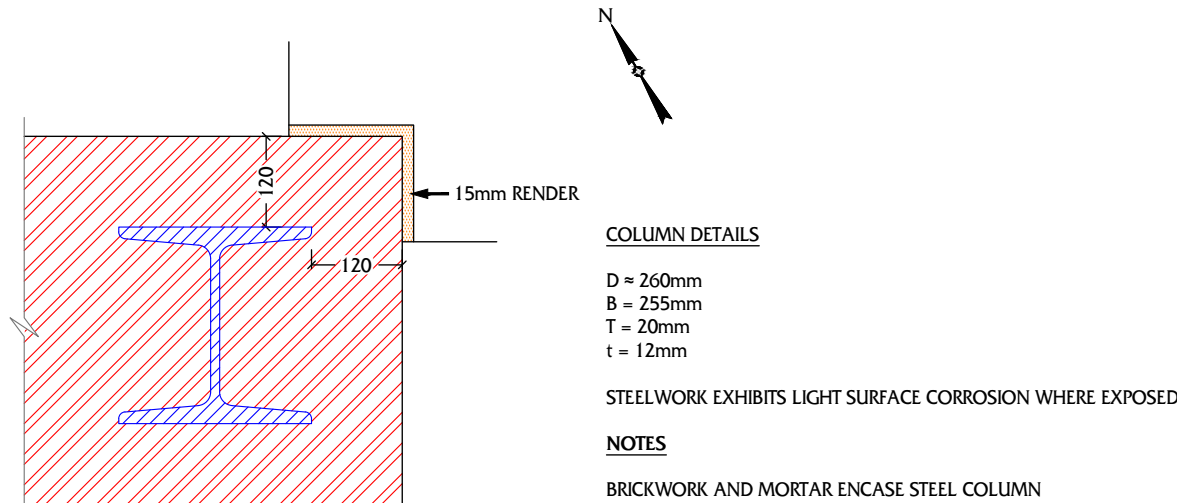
PART PLAN SHOWING DETAILS OF COLUMN C3 SCALE 1:10
